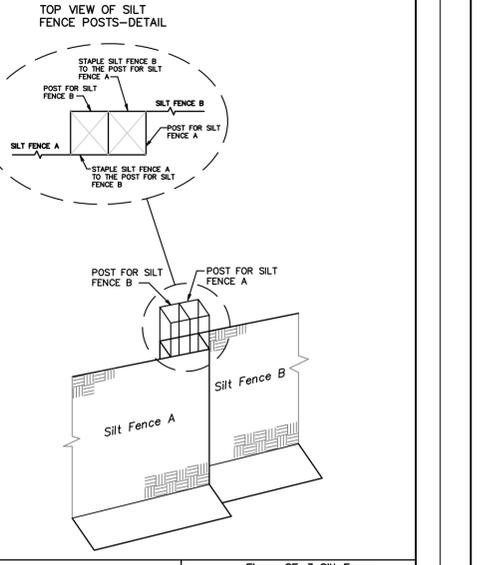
Silt Fence Joint Tying Construction Detail and Maintenance Requirements
